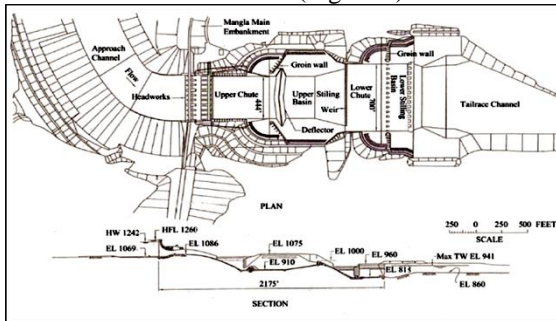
Plan and Longitudinal section of Mangla Dam Spillway
